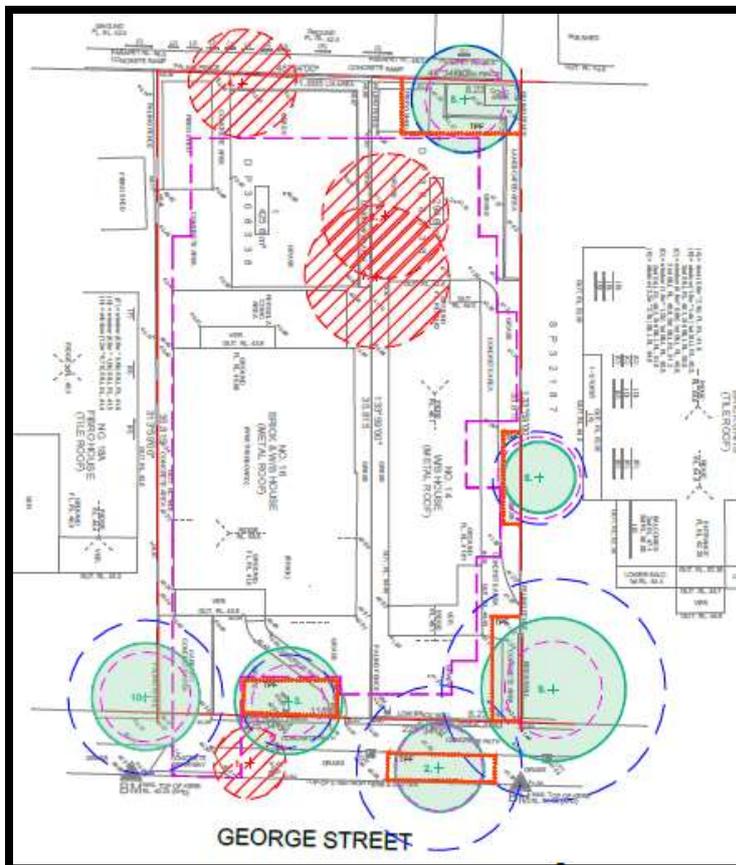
Trees to be removed (shown as red) and trees to be retained (highlighted green) (courtesy: Landscape Plan, Zenith Landscape Designs, 2019)
